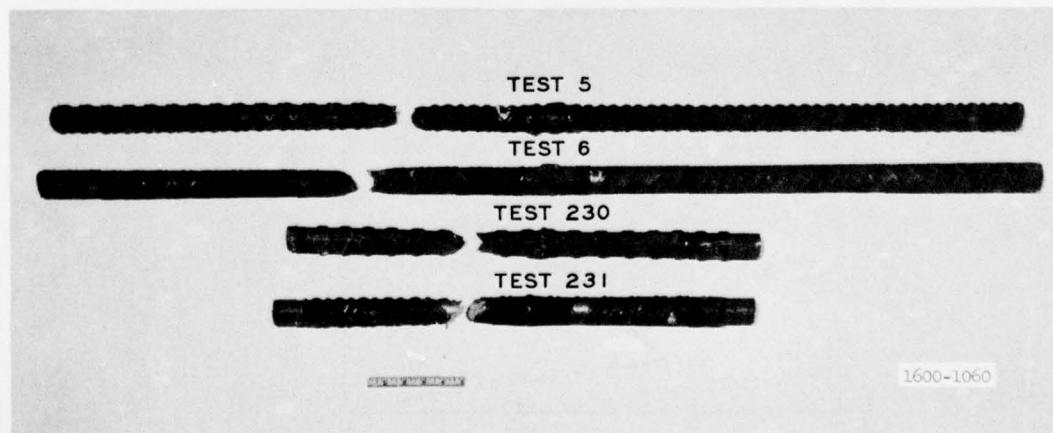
Posttest, single-vee groove weld butt splice samples.
